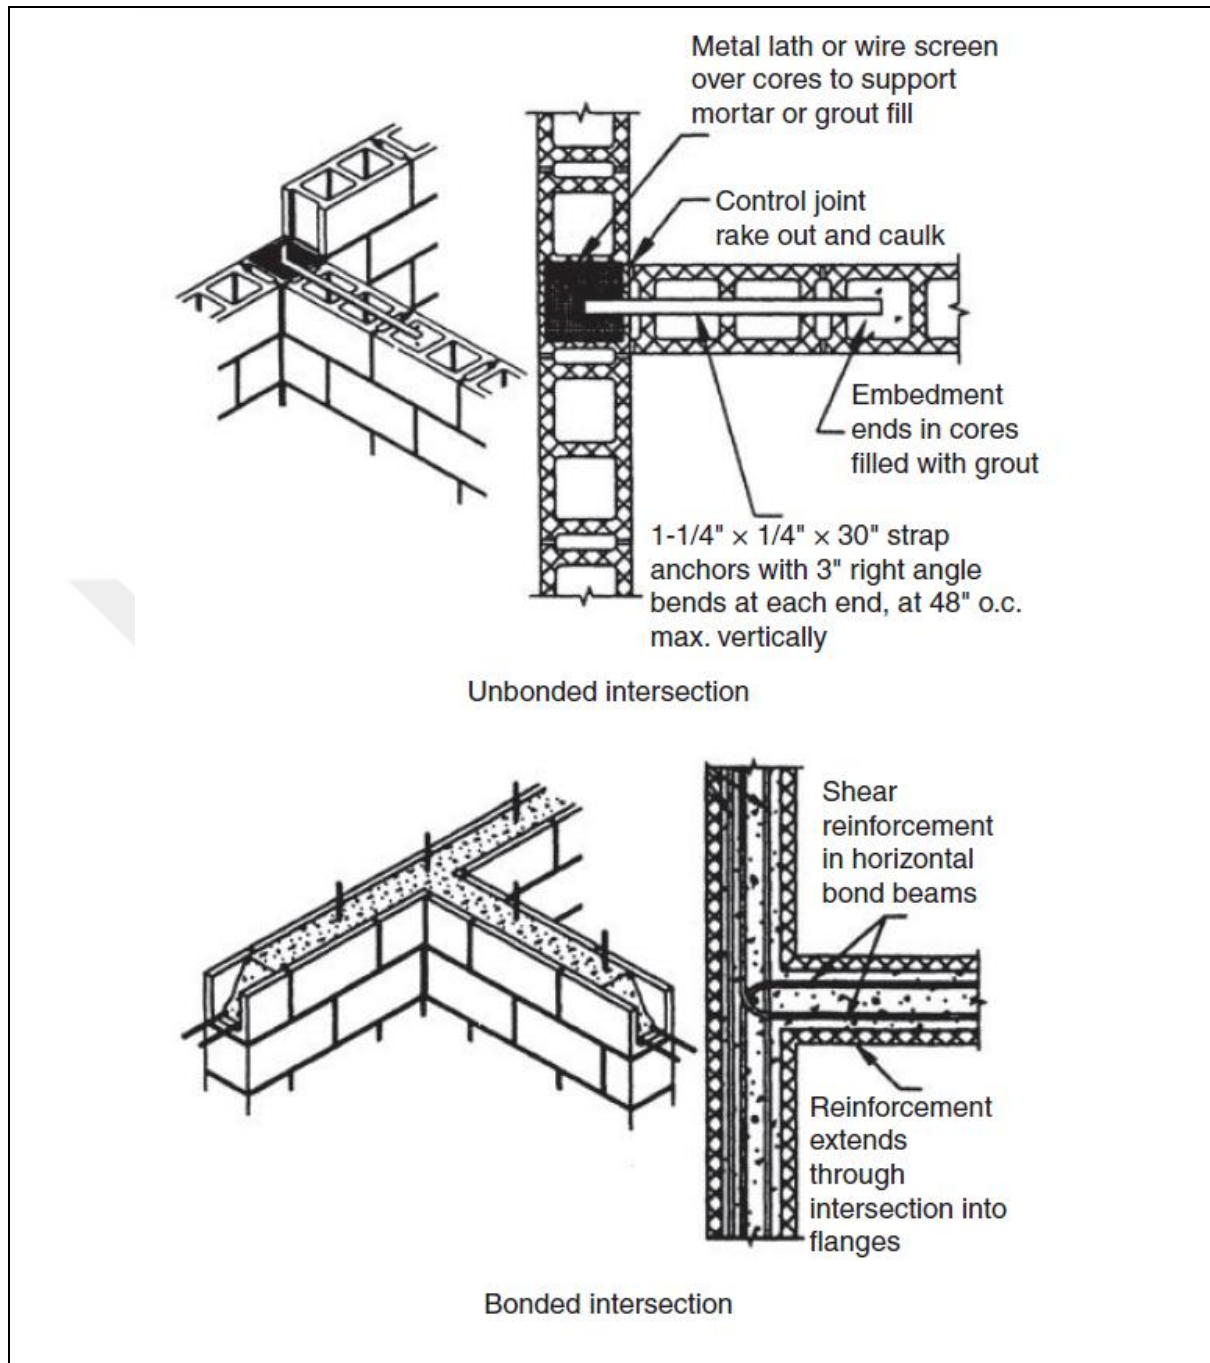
Reinforcement in Bond Beams at Wall Intersections.
